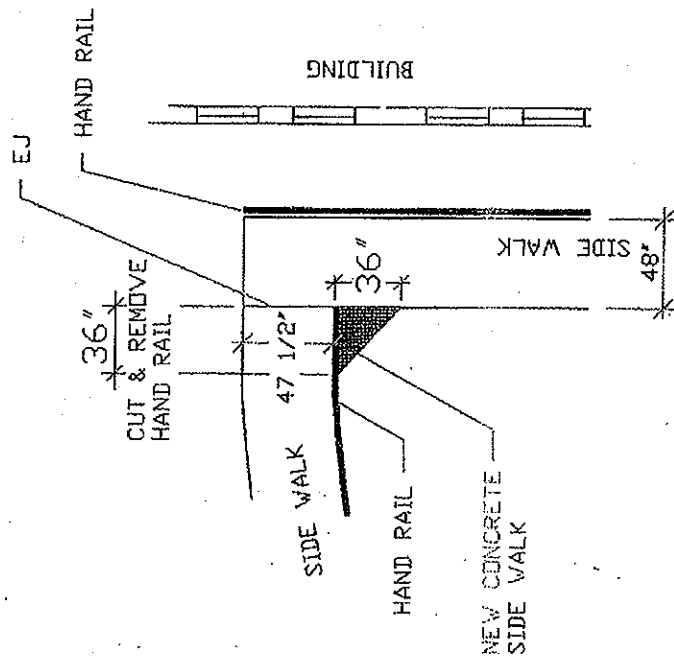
" PARKING LOT SIDEWALK TO LOWER LEVEL
